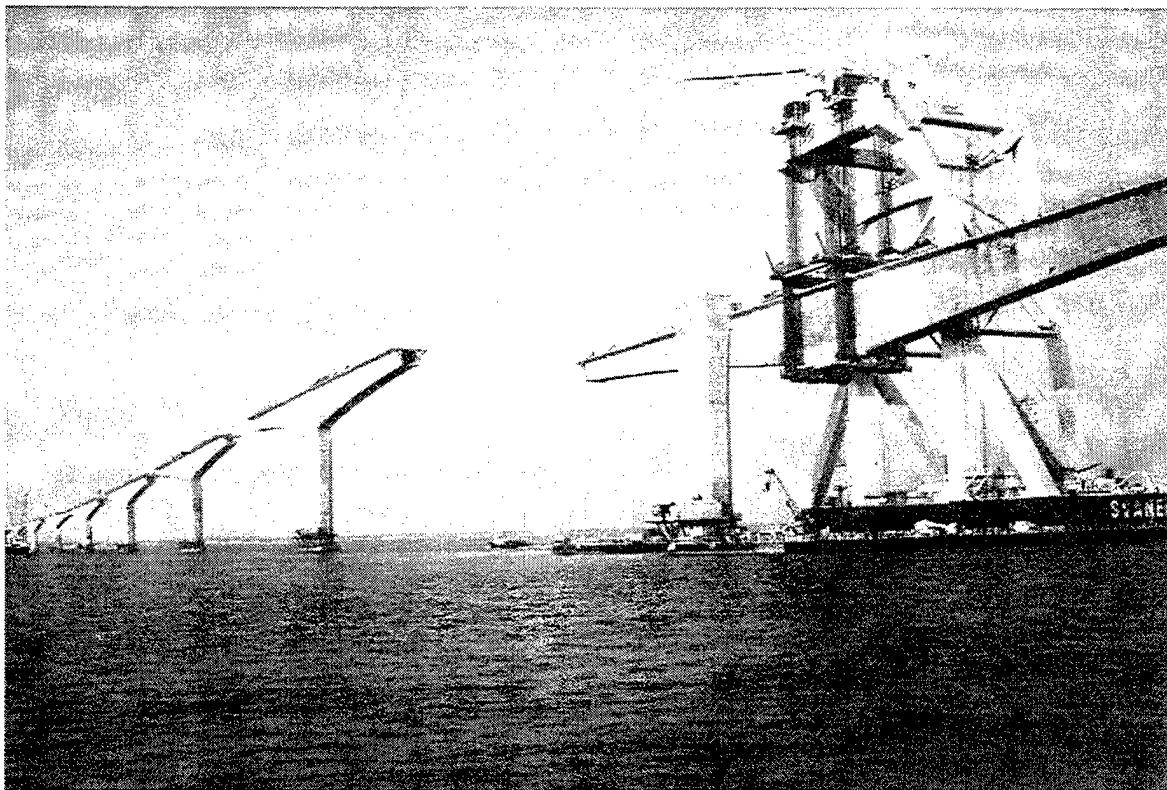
The Heavy Lift Vessel (Svanen) places a Main Girder in 1996
